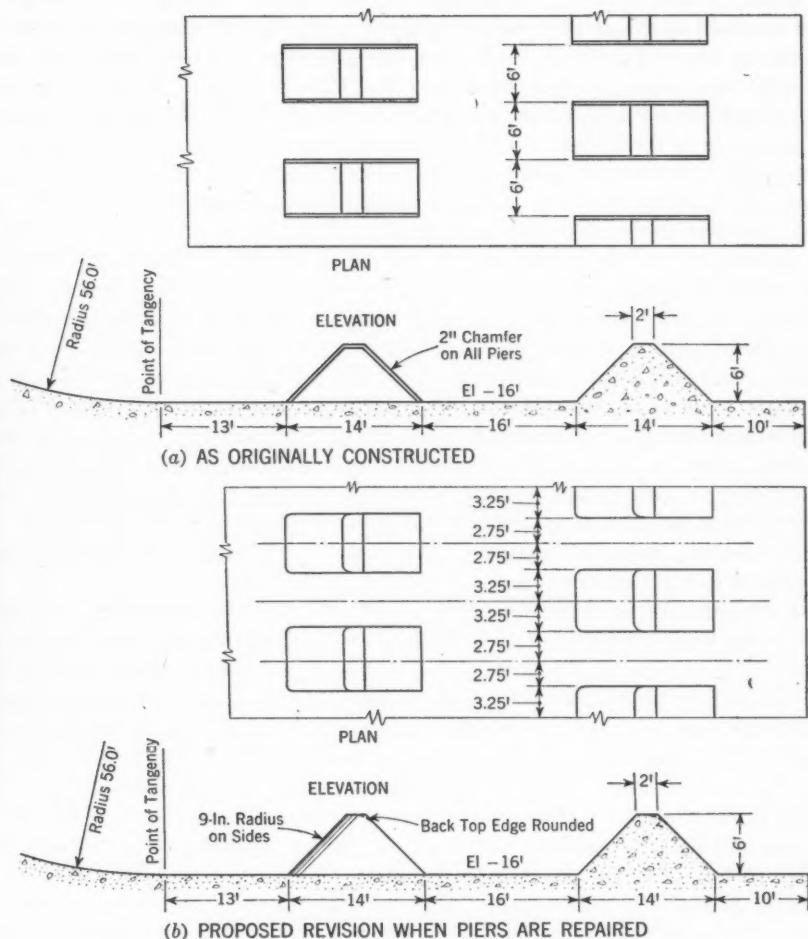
DIMENSIONS OF BAFFLE PIERS, SPILLWAY APRON, BONNEVILLE DAM
